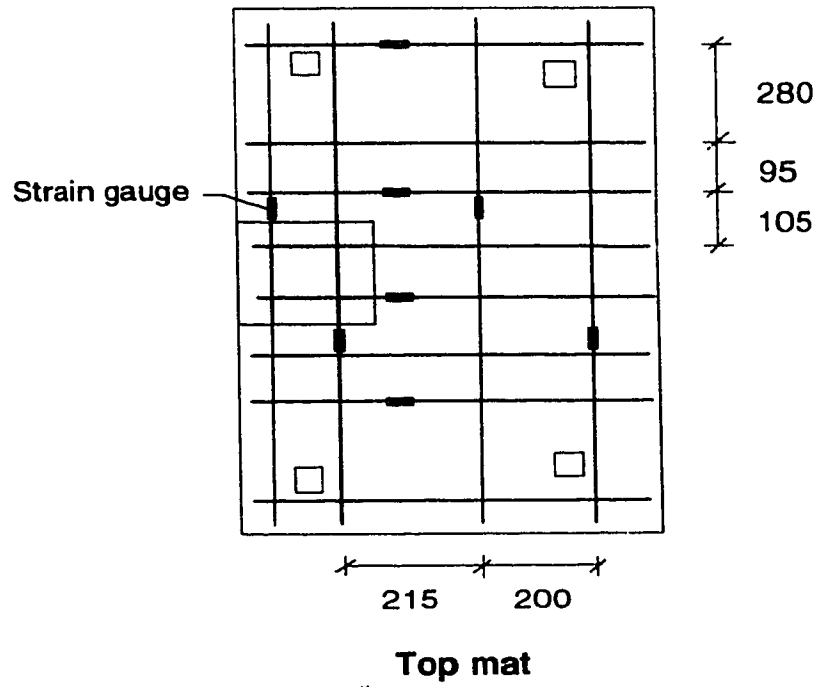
Column reinforcement and strain gauge layout (series D specimens)
